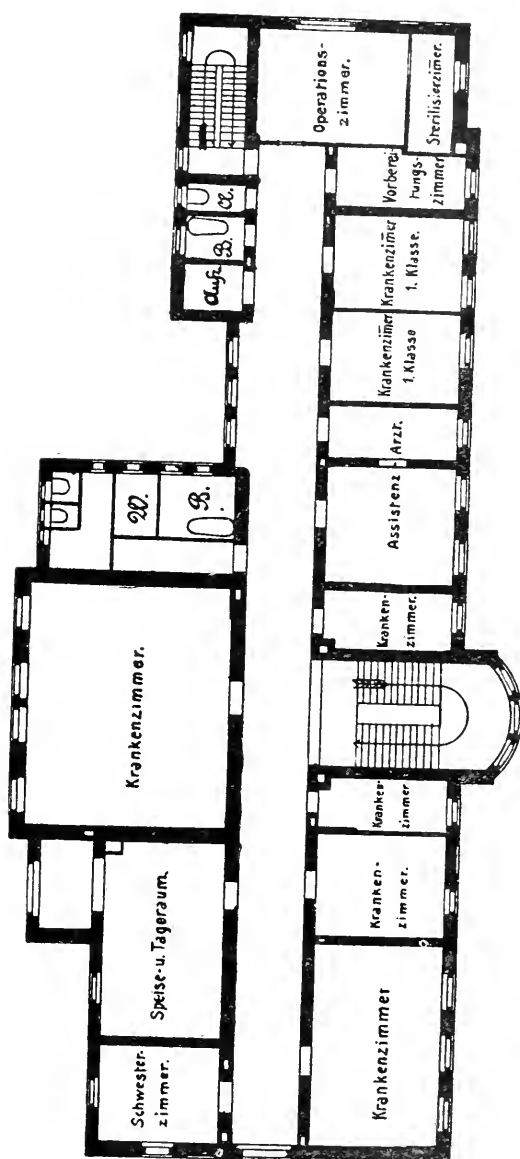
Plan of Bonn Eye Klinik. Second floor.
